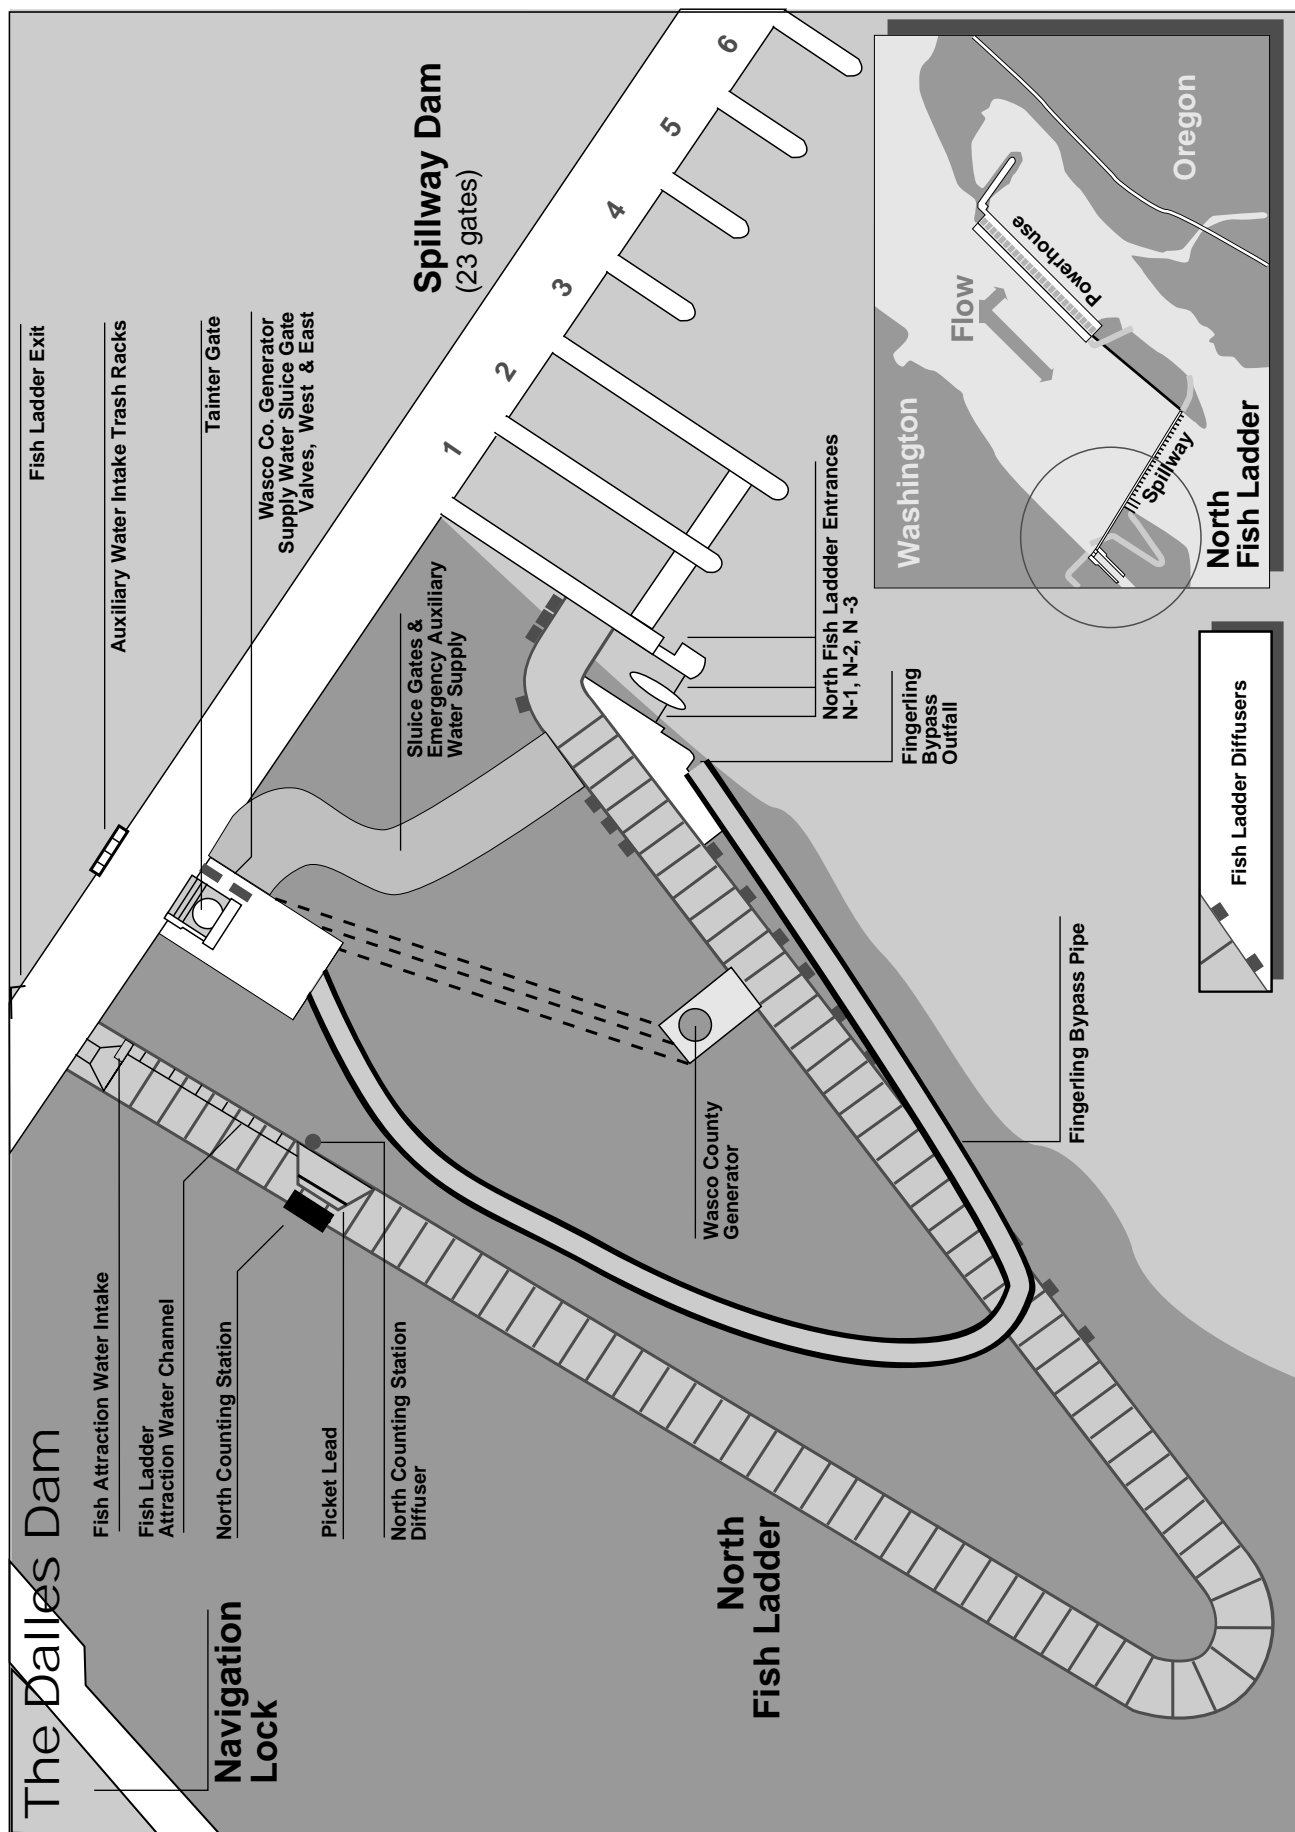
The Dalles Dam north fish ladder and spillway.
